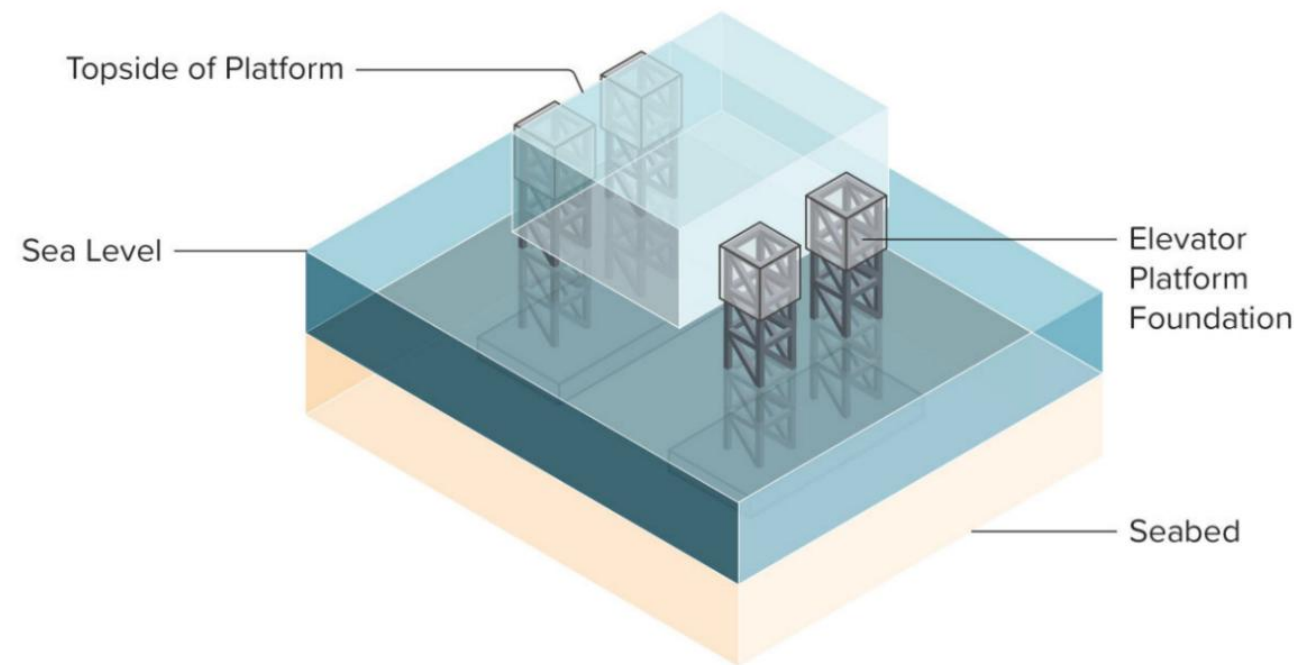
Indicative Arup Concept Elevating Platform Foundation Schematic
